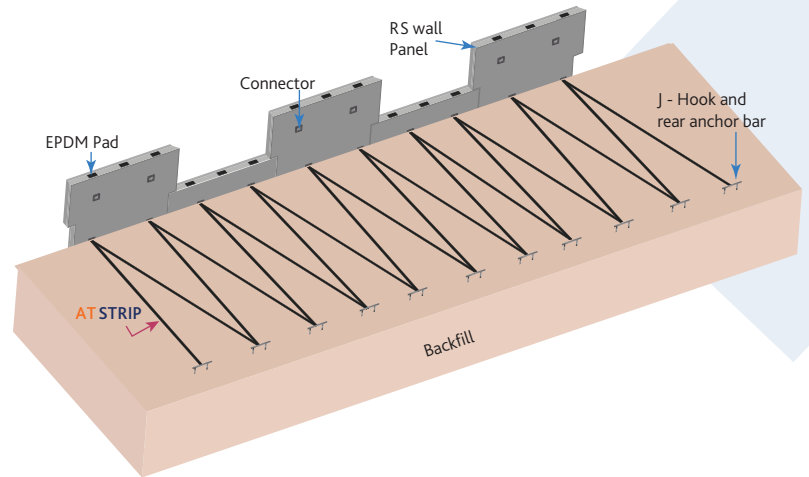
B. Isometric view of RS Wall with panel fascia & ATSTRIP
